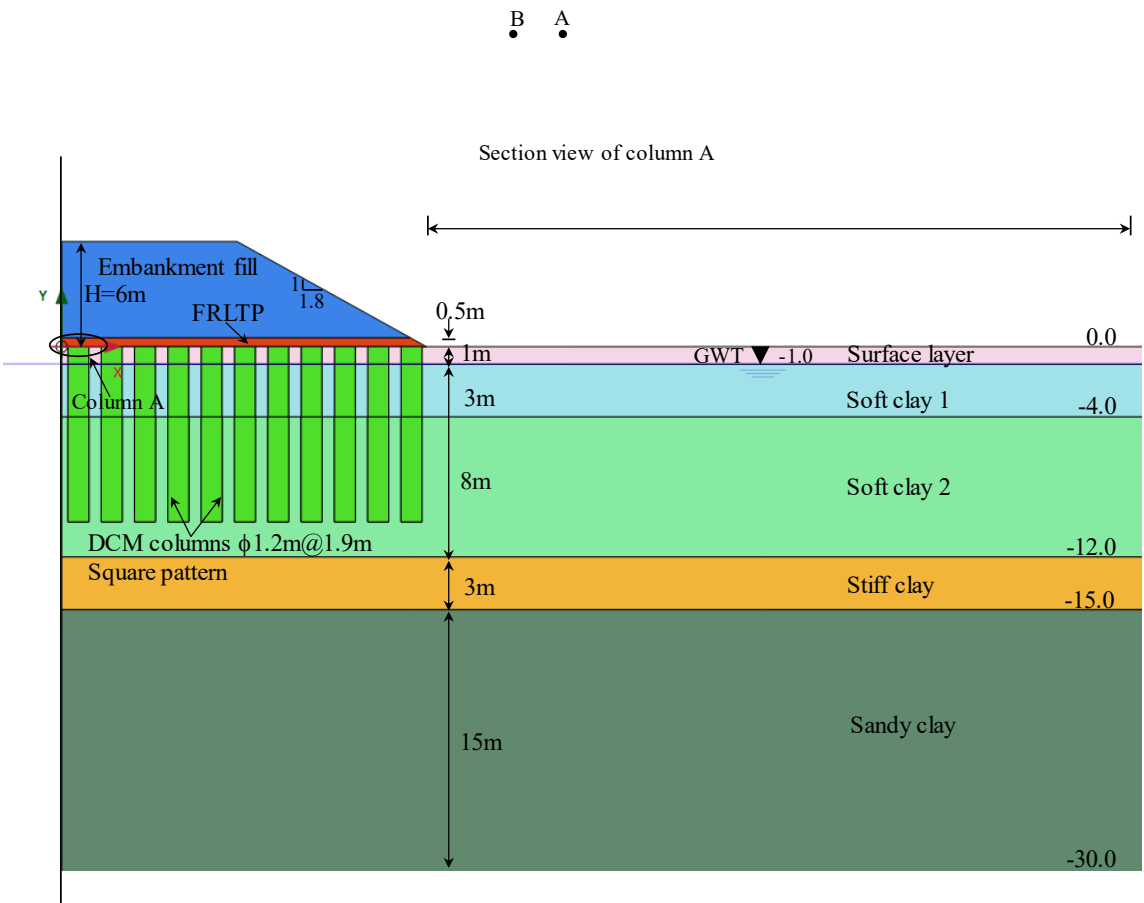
Cross-section of the FRLTP and DCM columns supported embankment
